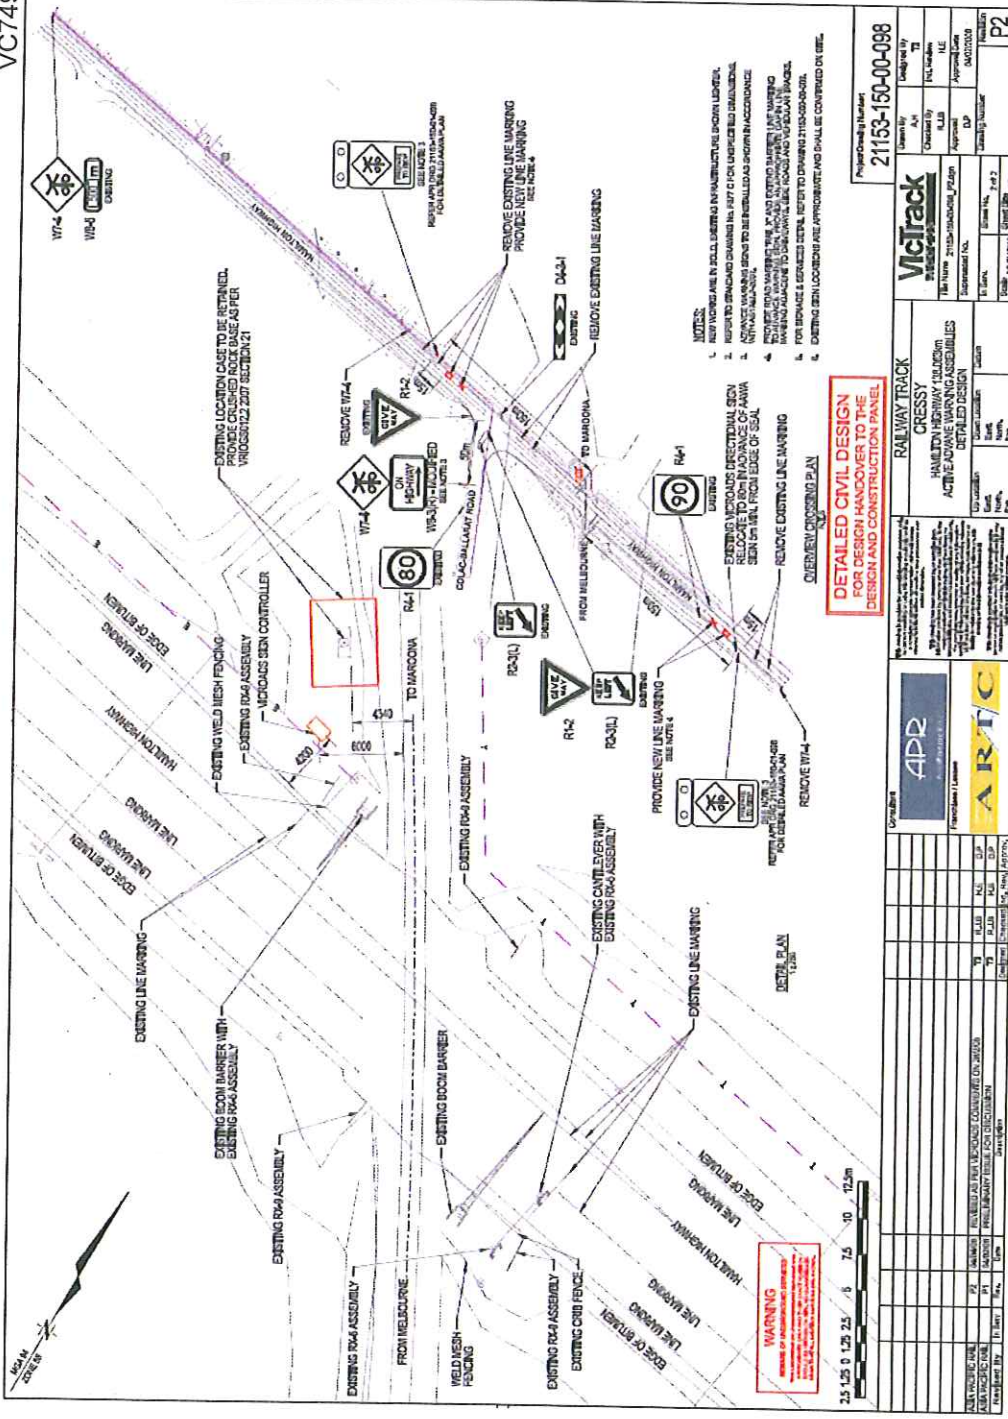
To be constructed drawings for the AAWS installation at the Cressy level crossing – plan 2
